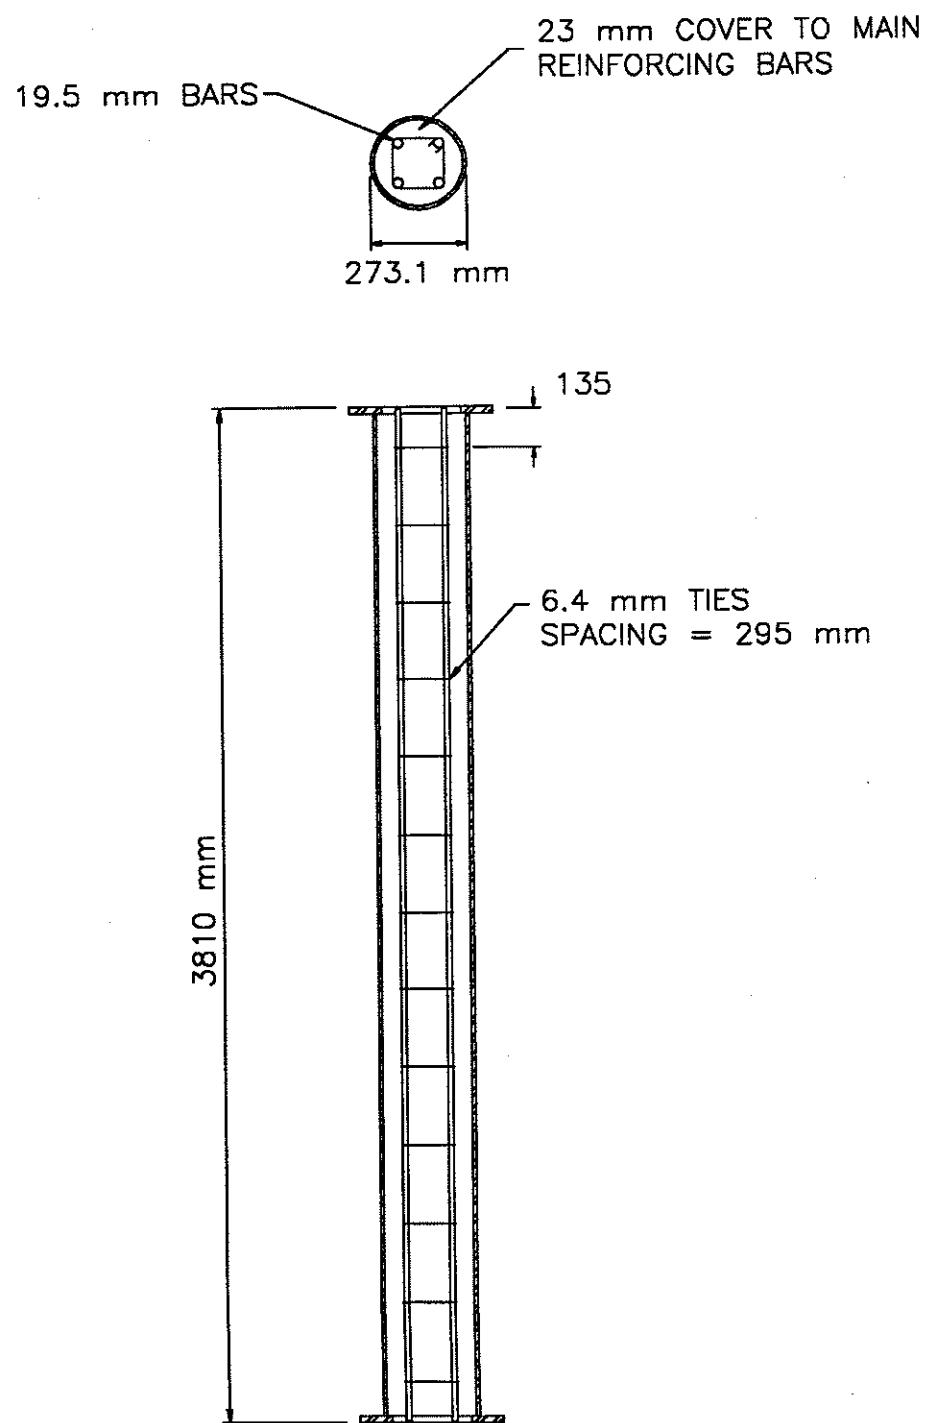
Elevation and cross-section of Column Nos. C-48 and C-49
